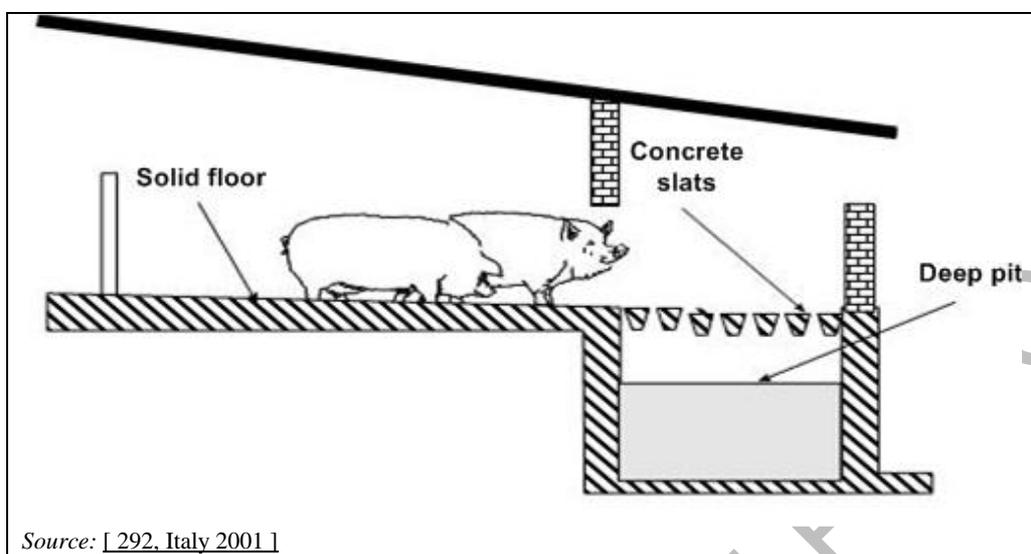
Solid concrete floor and fully-slatted external alley with storage pit underneath
